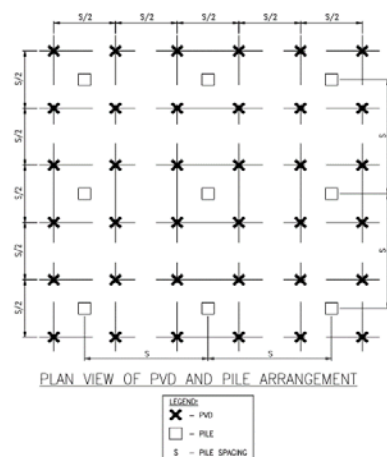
Plan View of Intersection of Transition Pile with PVD
